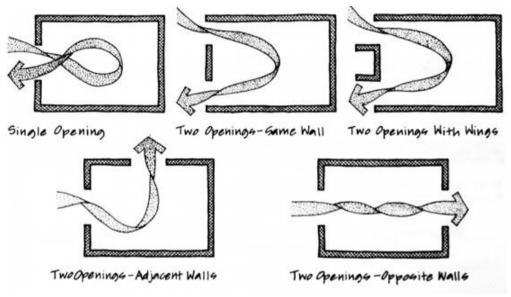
Windows opening and ventilation. Image from (Smith, 2011)
